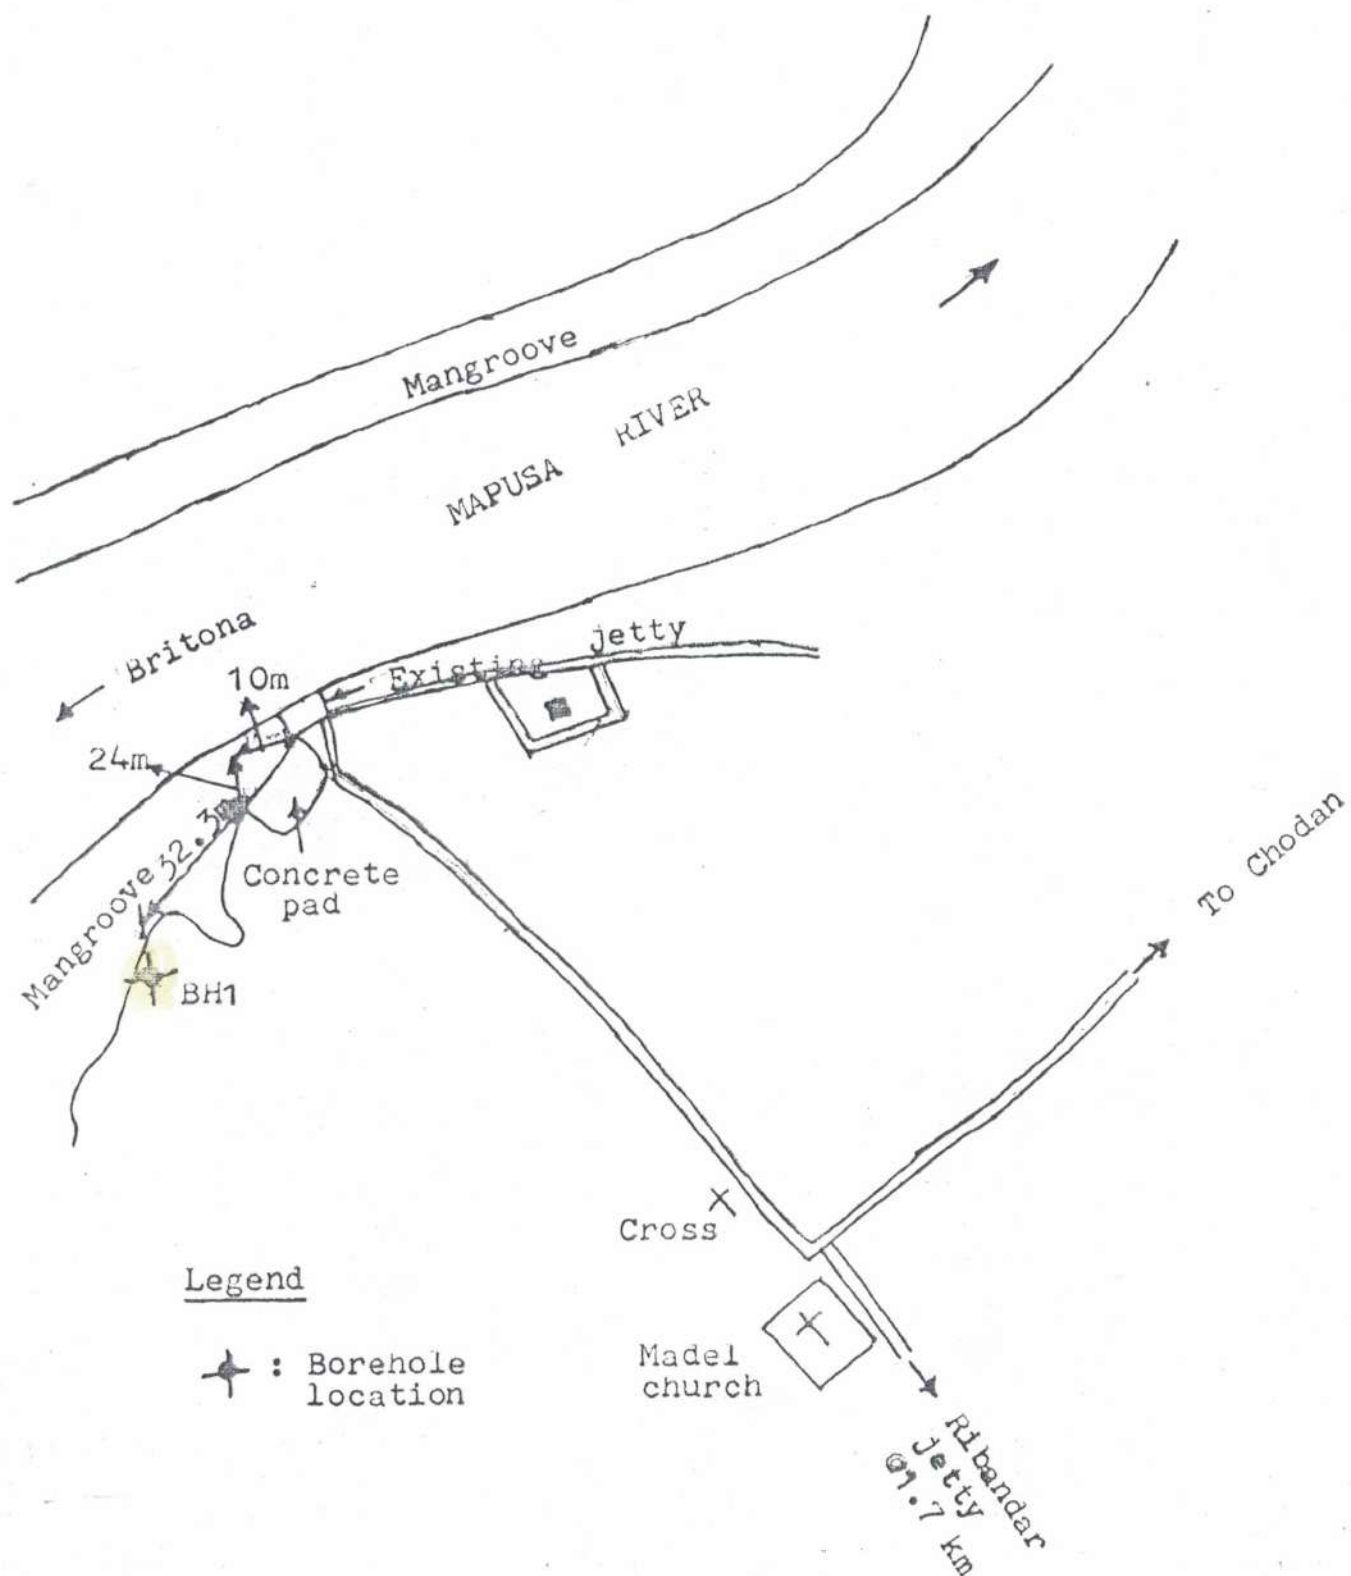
SITE LAYOUT PLAN SHOWING BOREHOLE LOCATION (NTS)
